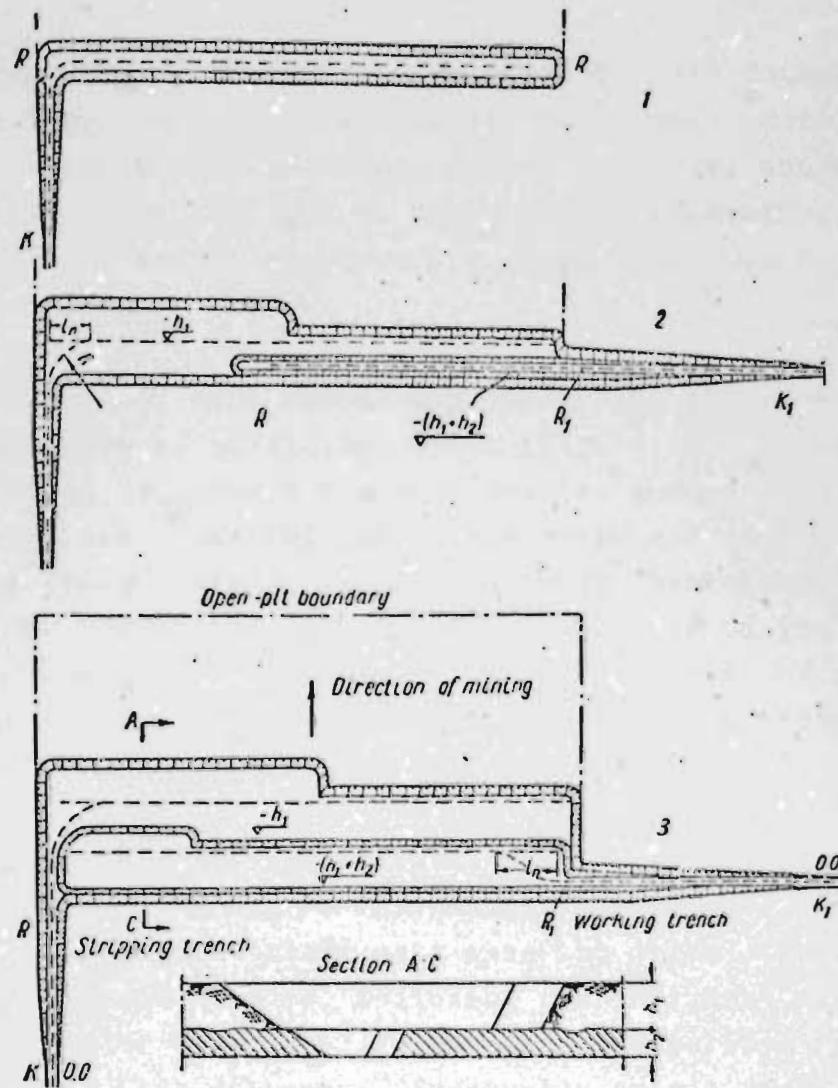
Layout of a pit with separate trenches (from Shevyakov p. 653).
